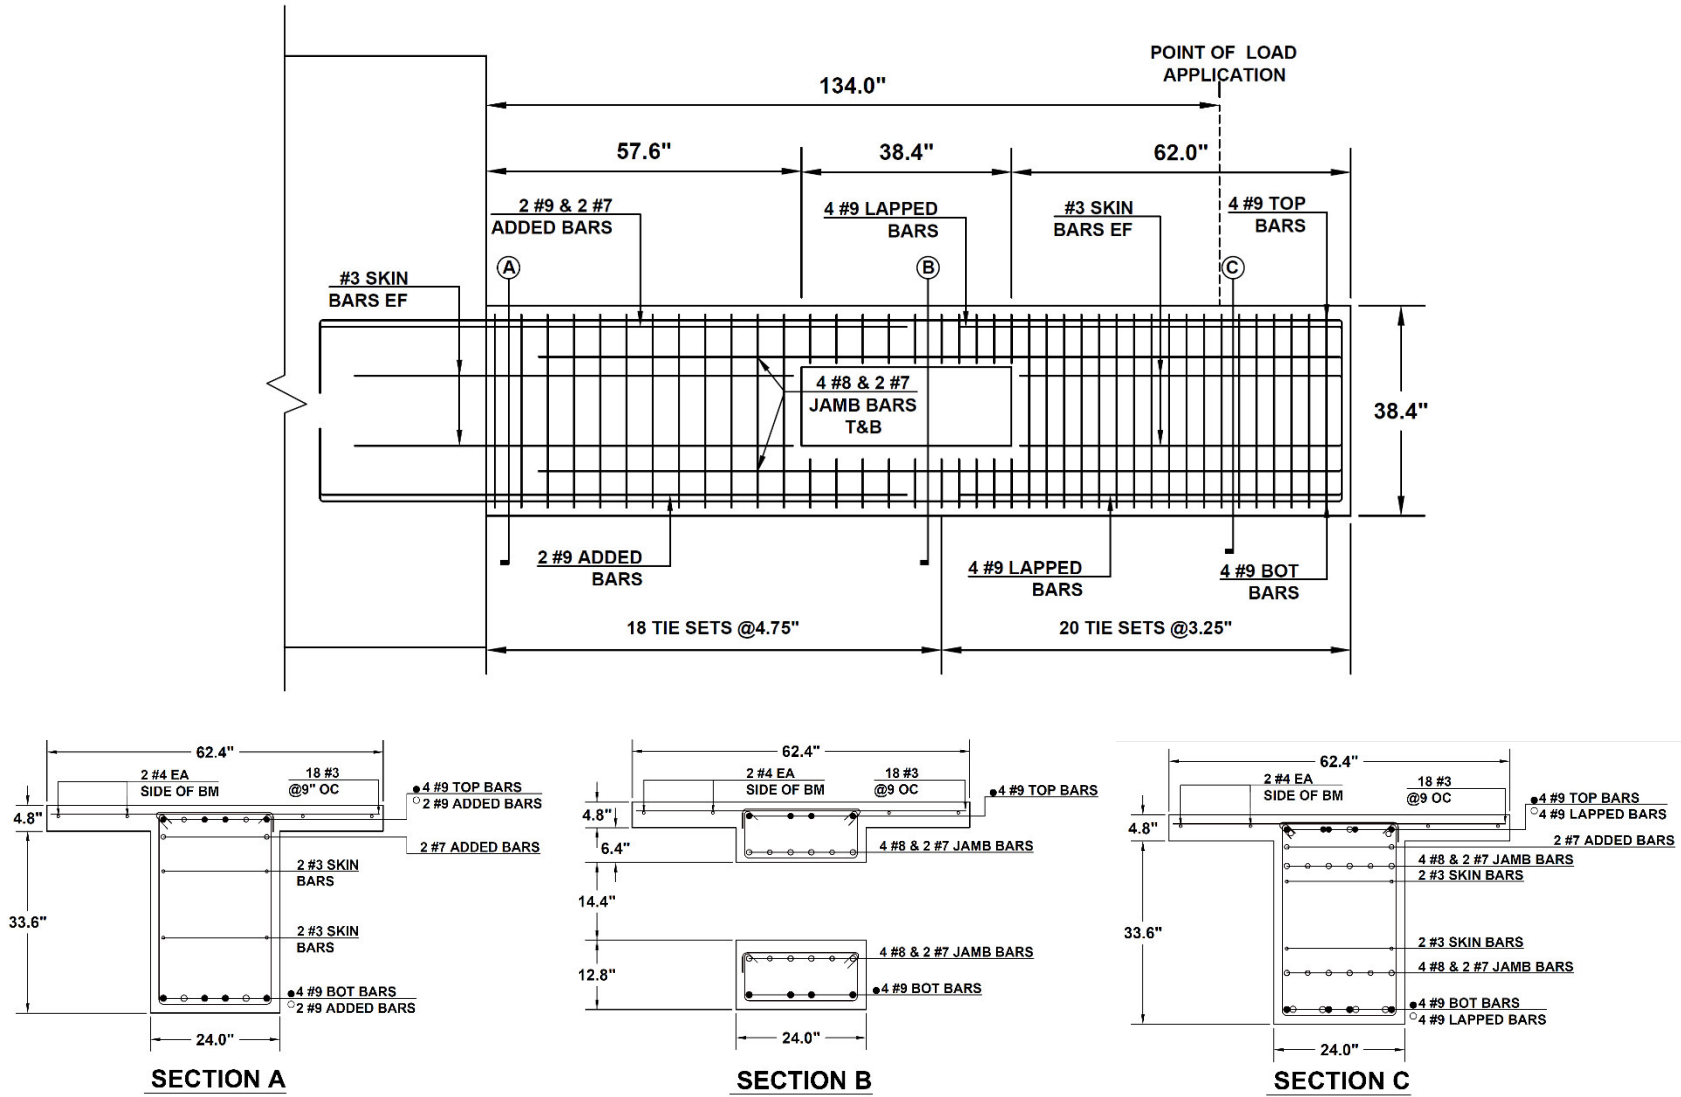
Beam elevation geometry and reinforcement details for S1
